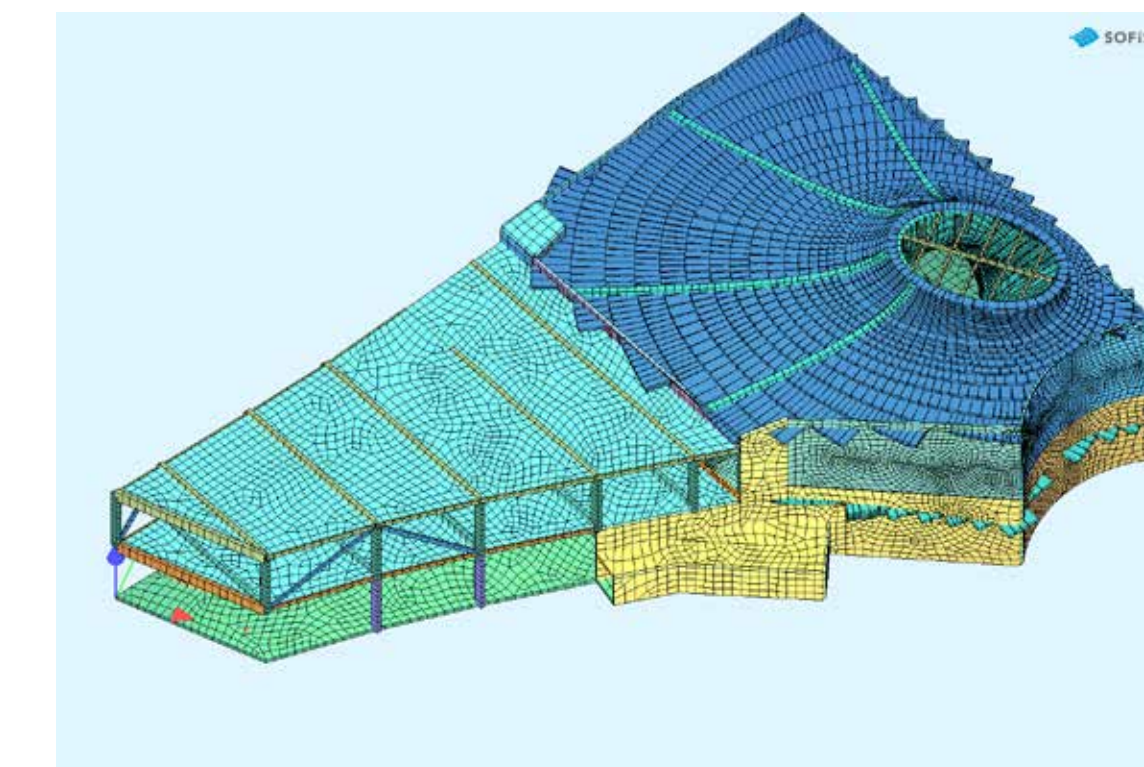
3d structural model extruded with real thickness (first floor + trusses)
